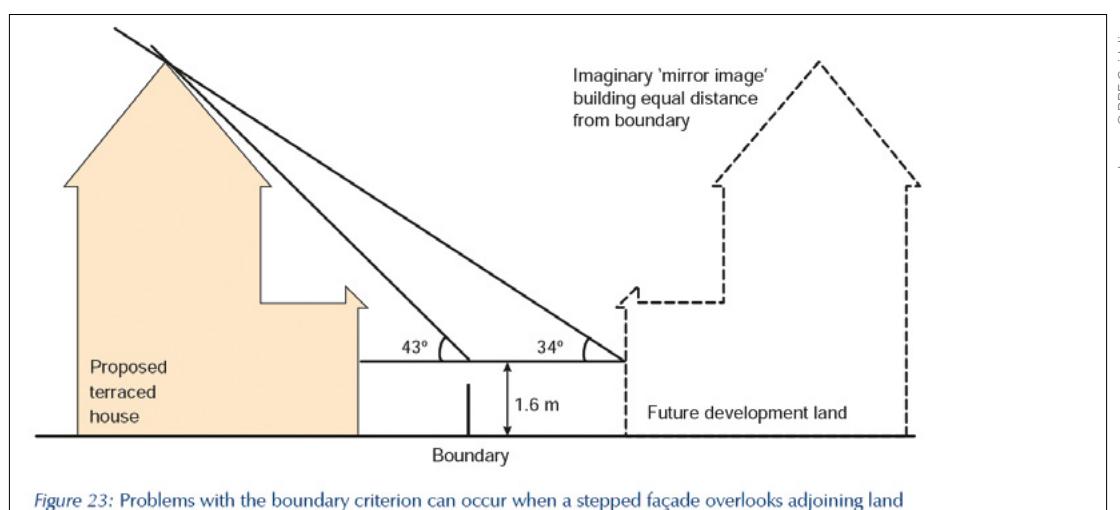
Problems with the boundary criterion can occur when a stepped façade overlooks adjoining land
